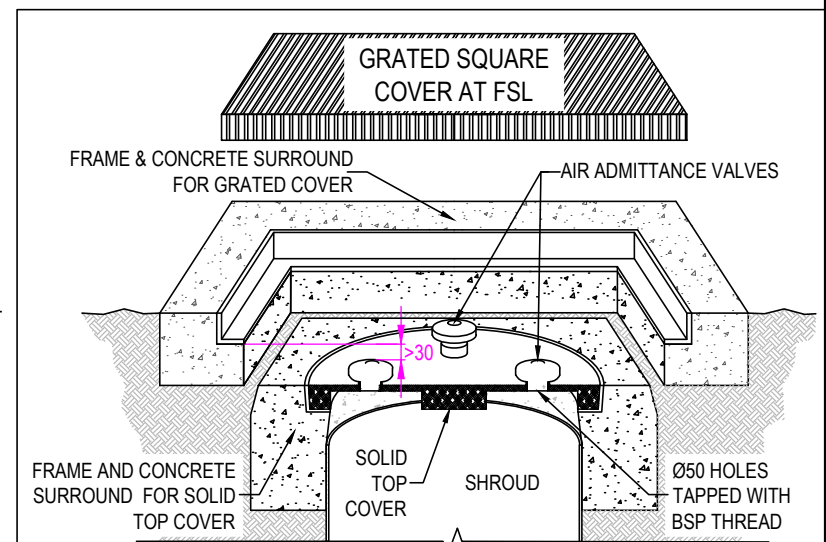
B-I: GROUND LEVEL VENT ARRANGEMENT (ISOMETRIC CUT THROUGH CENTRE)
